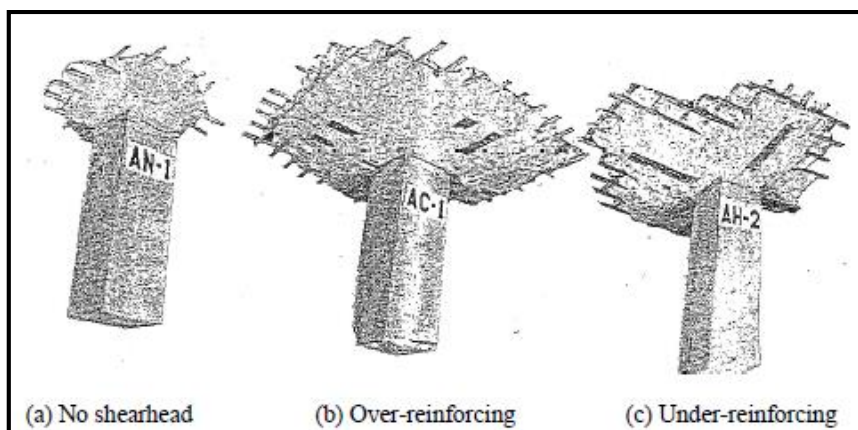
Typical failure modes of flat slab without or with shear head reinforcement (Corley and Hawkins, 1968).
